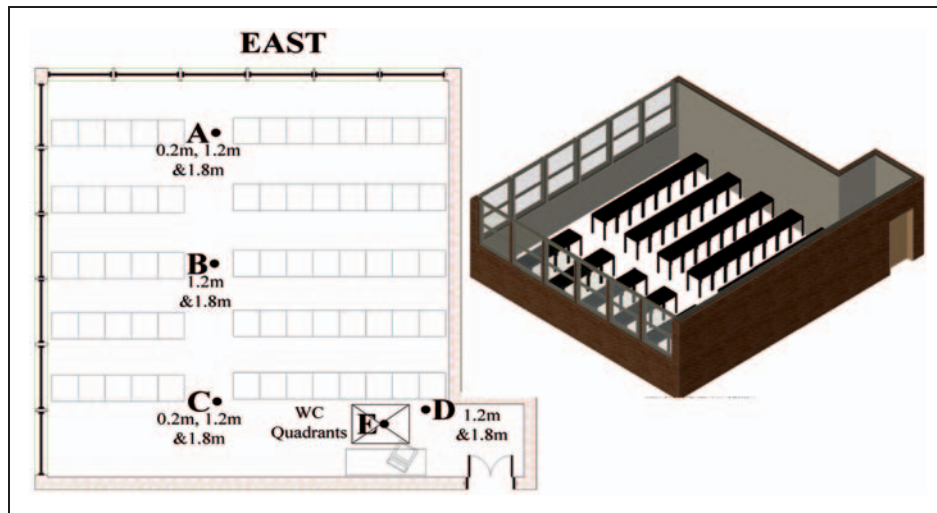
The floor plan and perspective layout of the classrooms 105 in the Palmer Building; the square with X is the location of the windcatcher on the ceiling.
